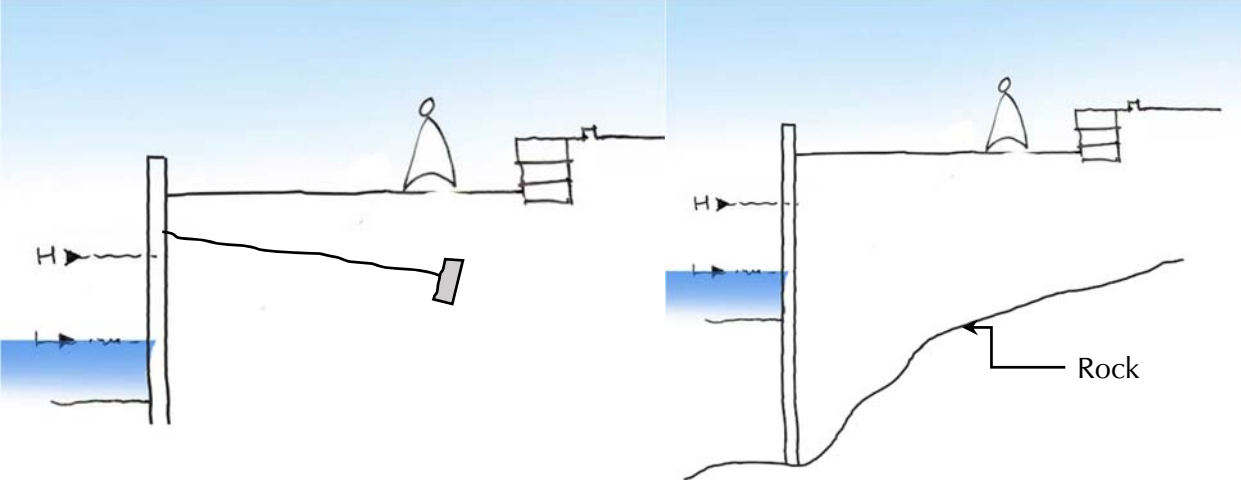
Examples of Sheetpile Construction, Standard and Cantilever
